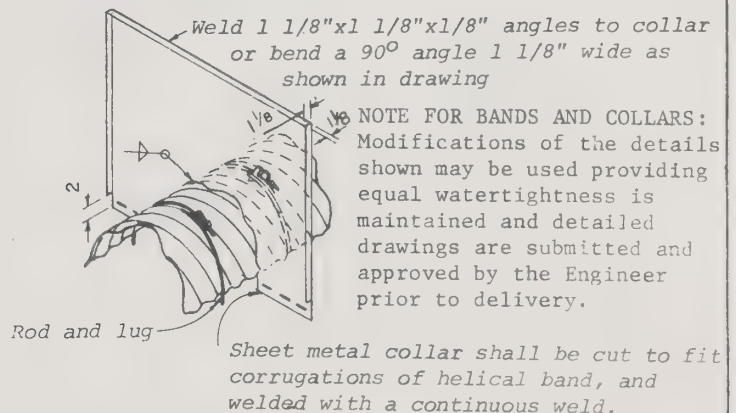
DETAILS OF CORRUGATED METAL ANTI-SEEP COLLAR
